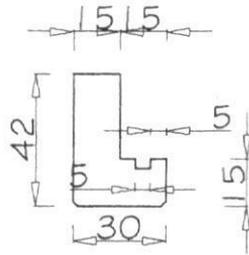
HARDIGLAZE PVC JOINTER DETAIL
